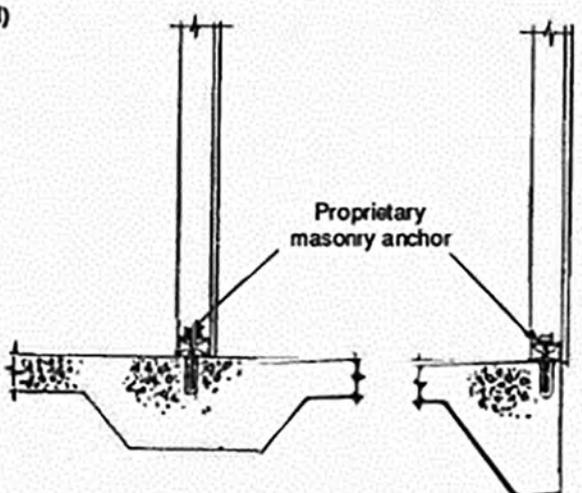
TIE-DOWN: BOTTOM OF BRACING WALLS	Design Strength (kN)
